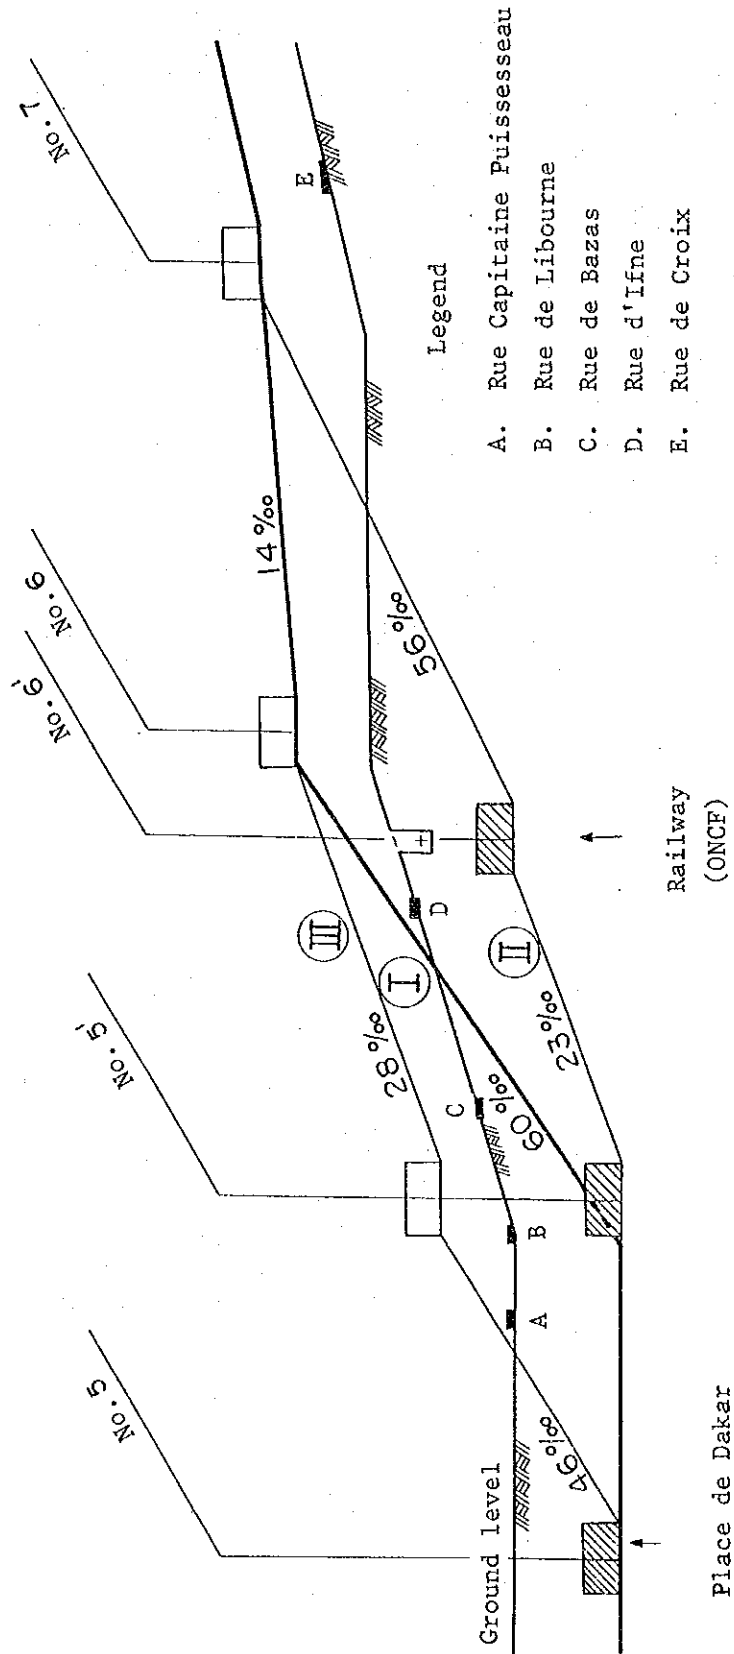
Profile of the Shift in Structures : Shift from Underground into Elevated between la Place de Dakar and the Rue de Croix Crossing
